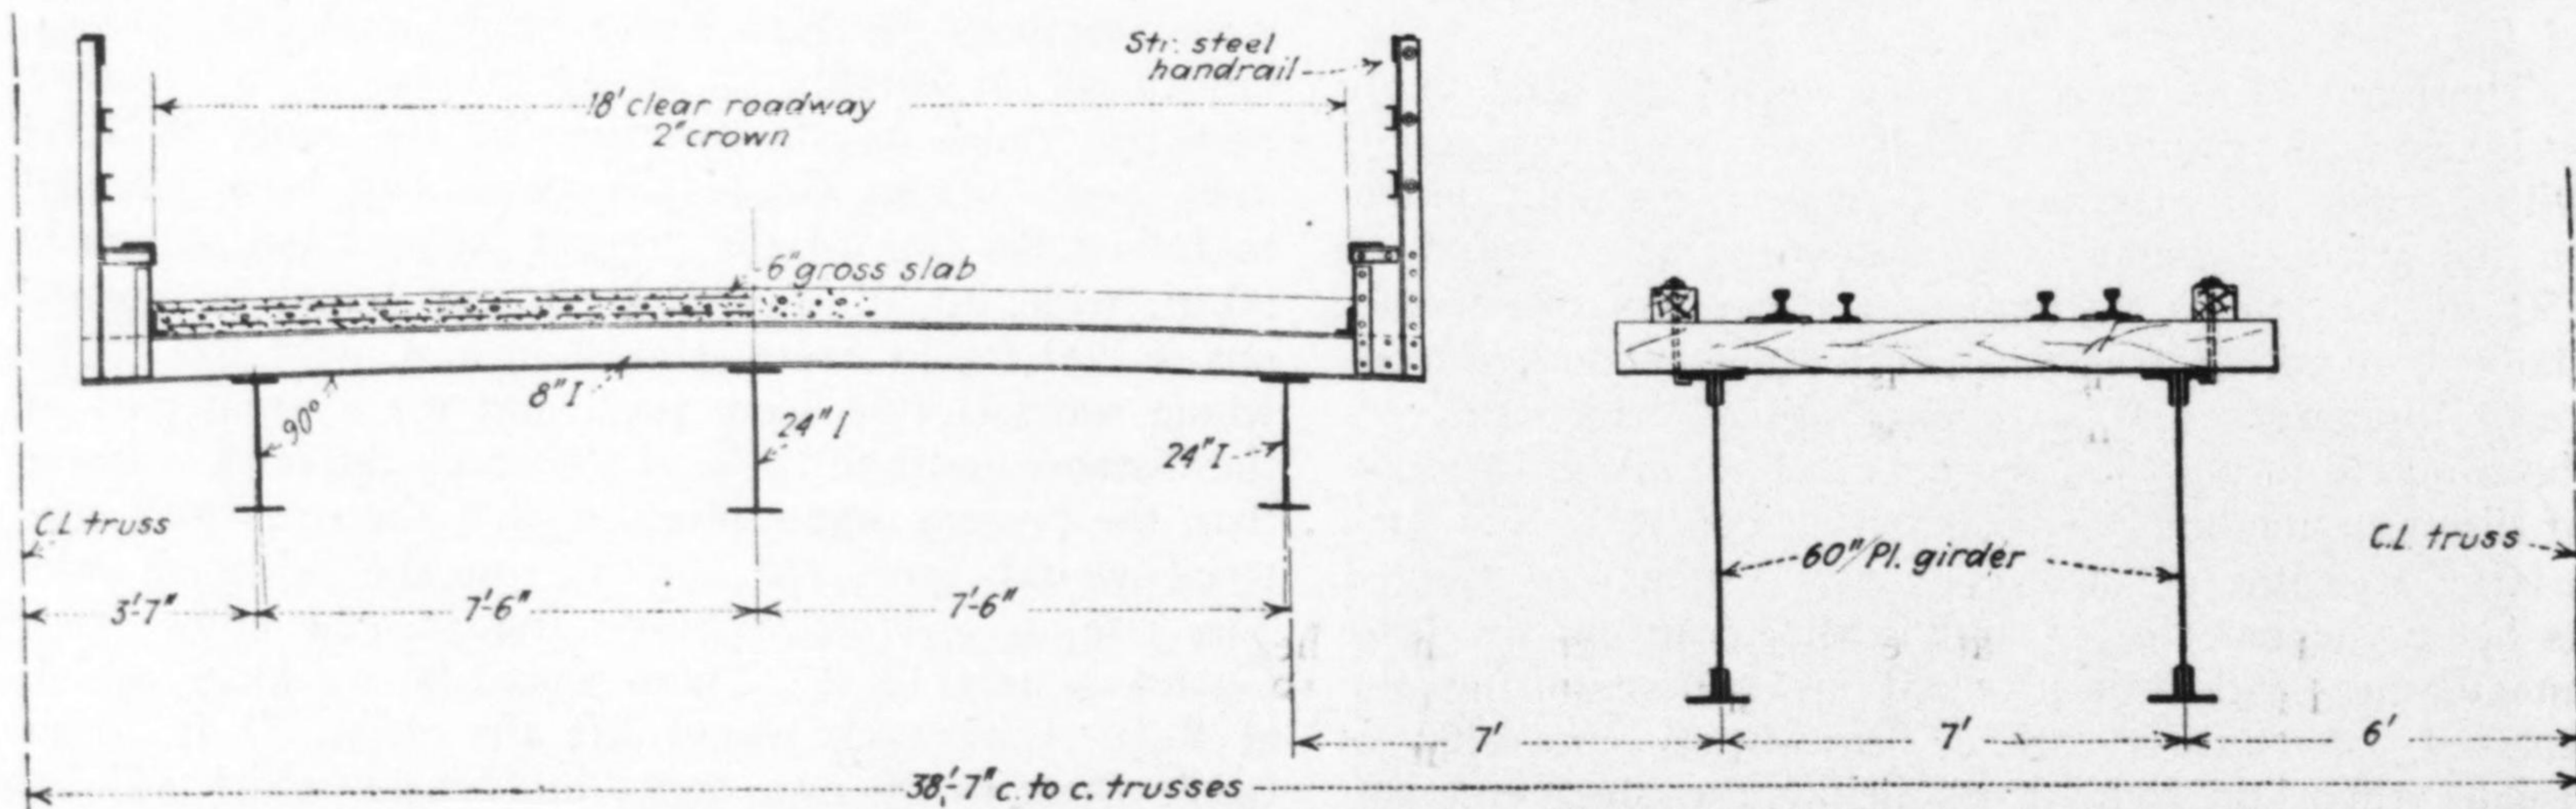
CROSS-SECTION OF RAILROAD AND HIGHWAY DECKS
